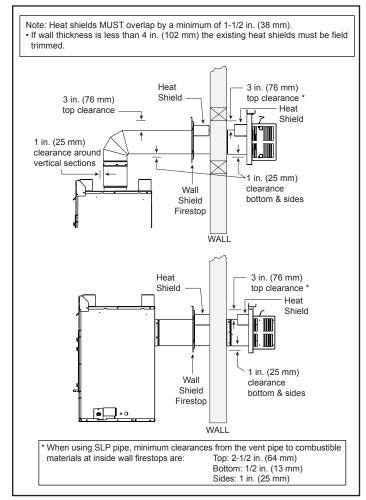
Horizontal Venting Clearances To Combustible Materials
